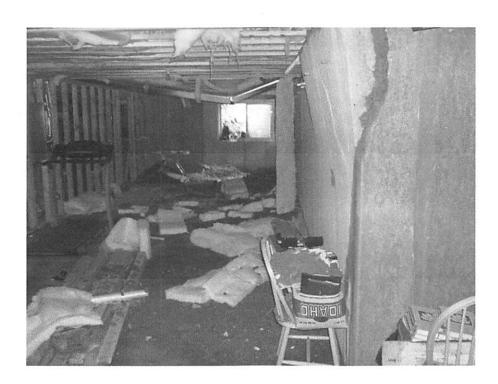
Basement at 1650 East 7687 South showing upper foundation wall (right side of photo) broken by landslide impact.
